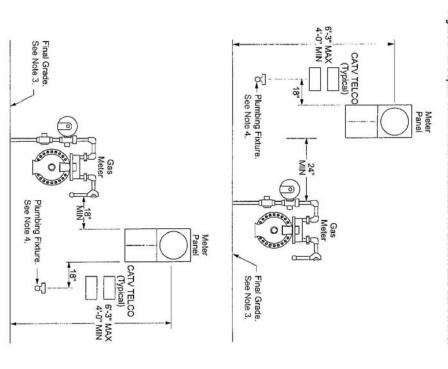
Minimum Enclosed Meter Clearances — 0–600 Volts
